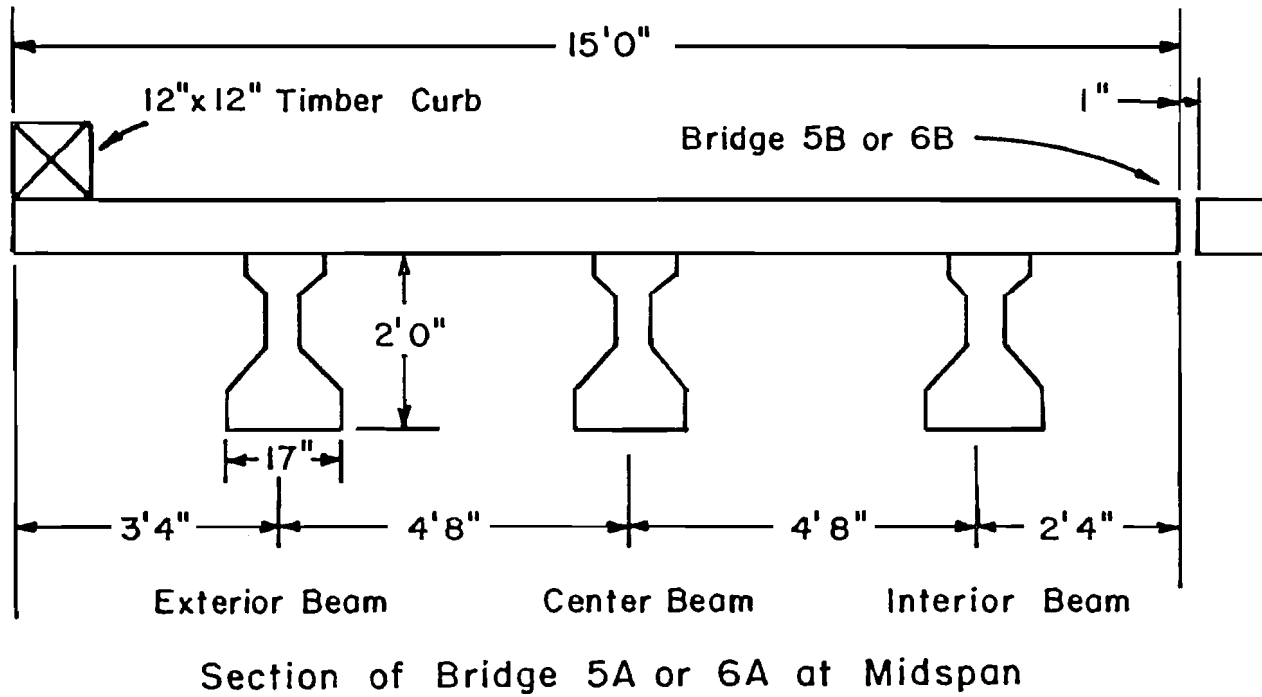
Typical AASHO Road Test prestressed bridge section
